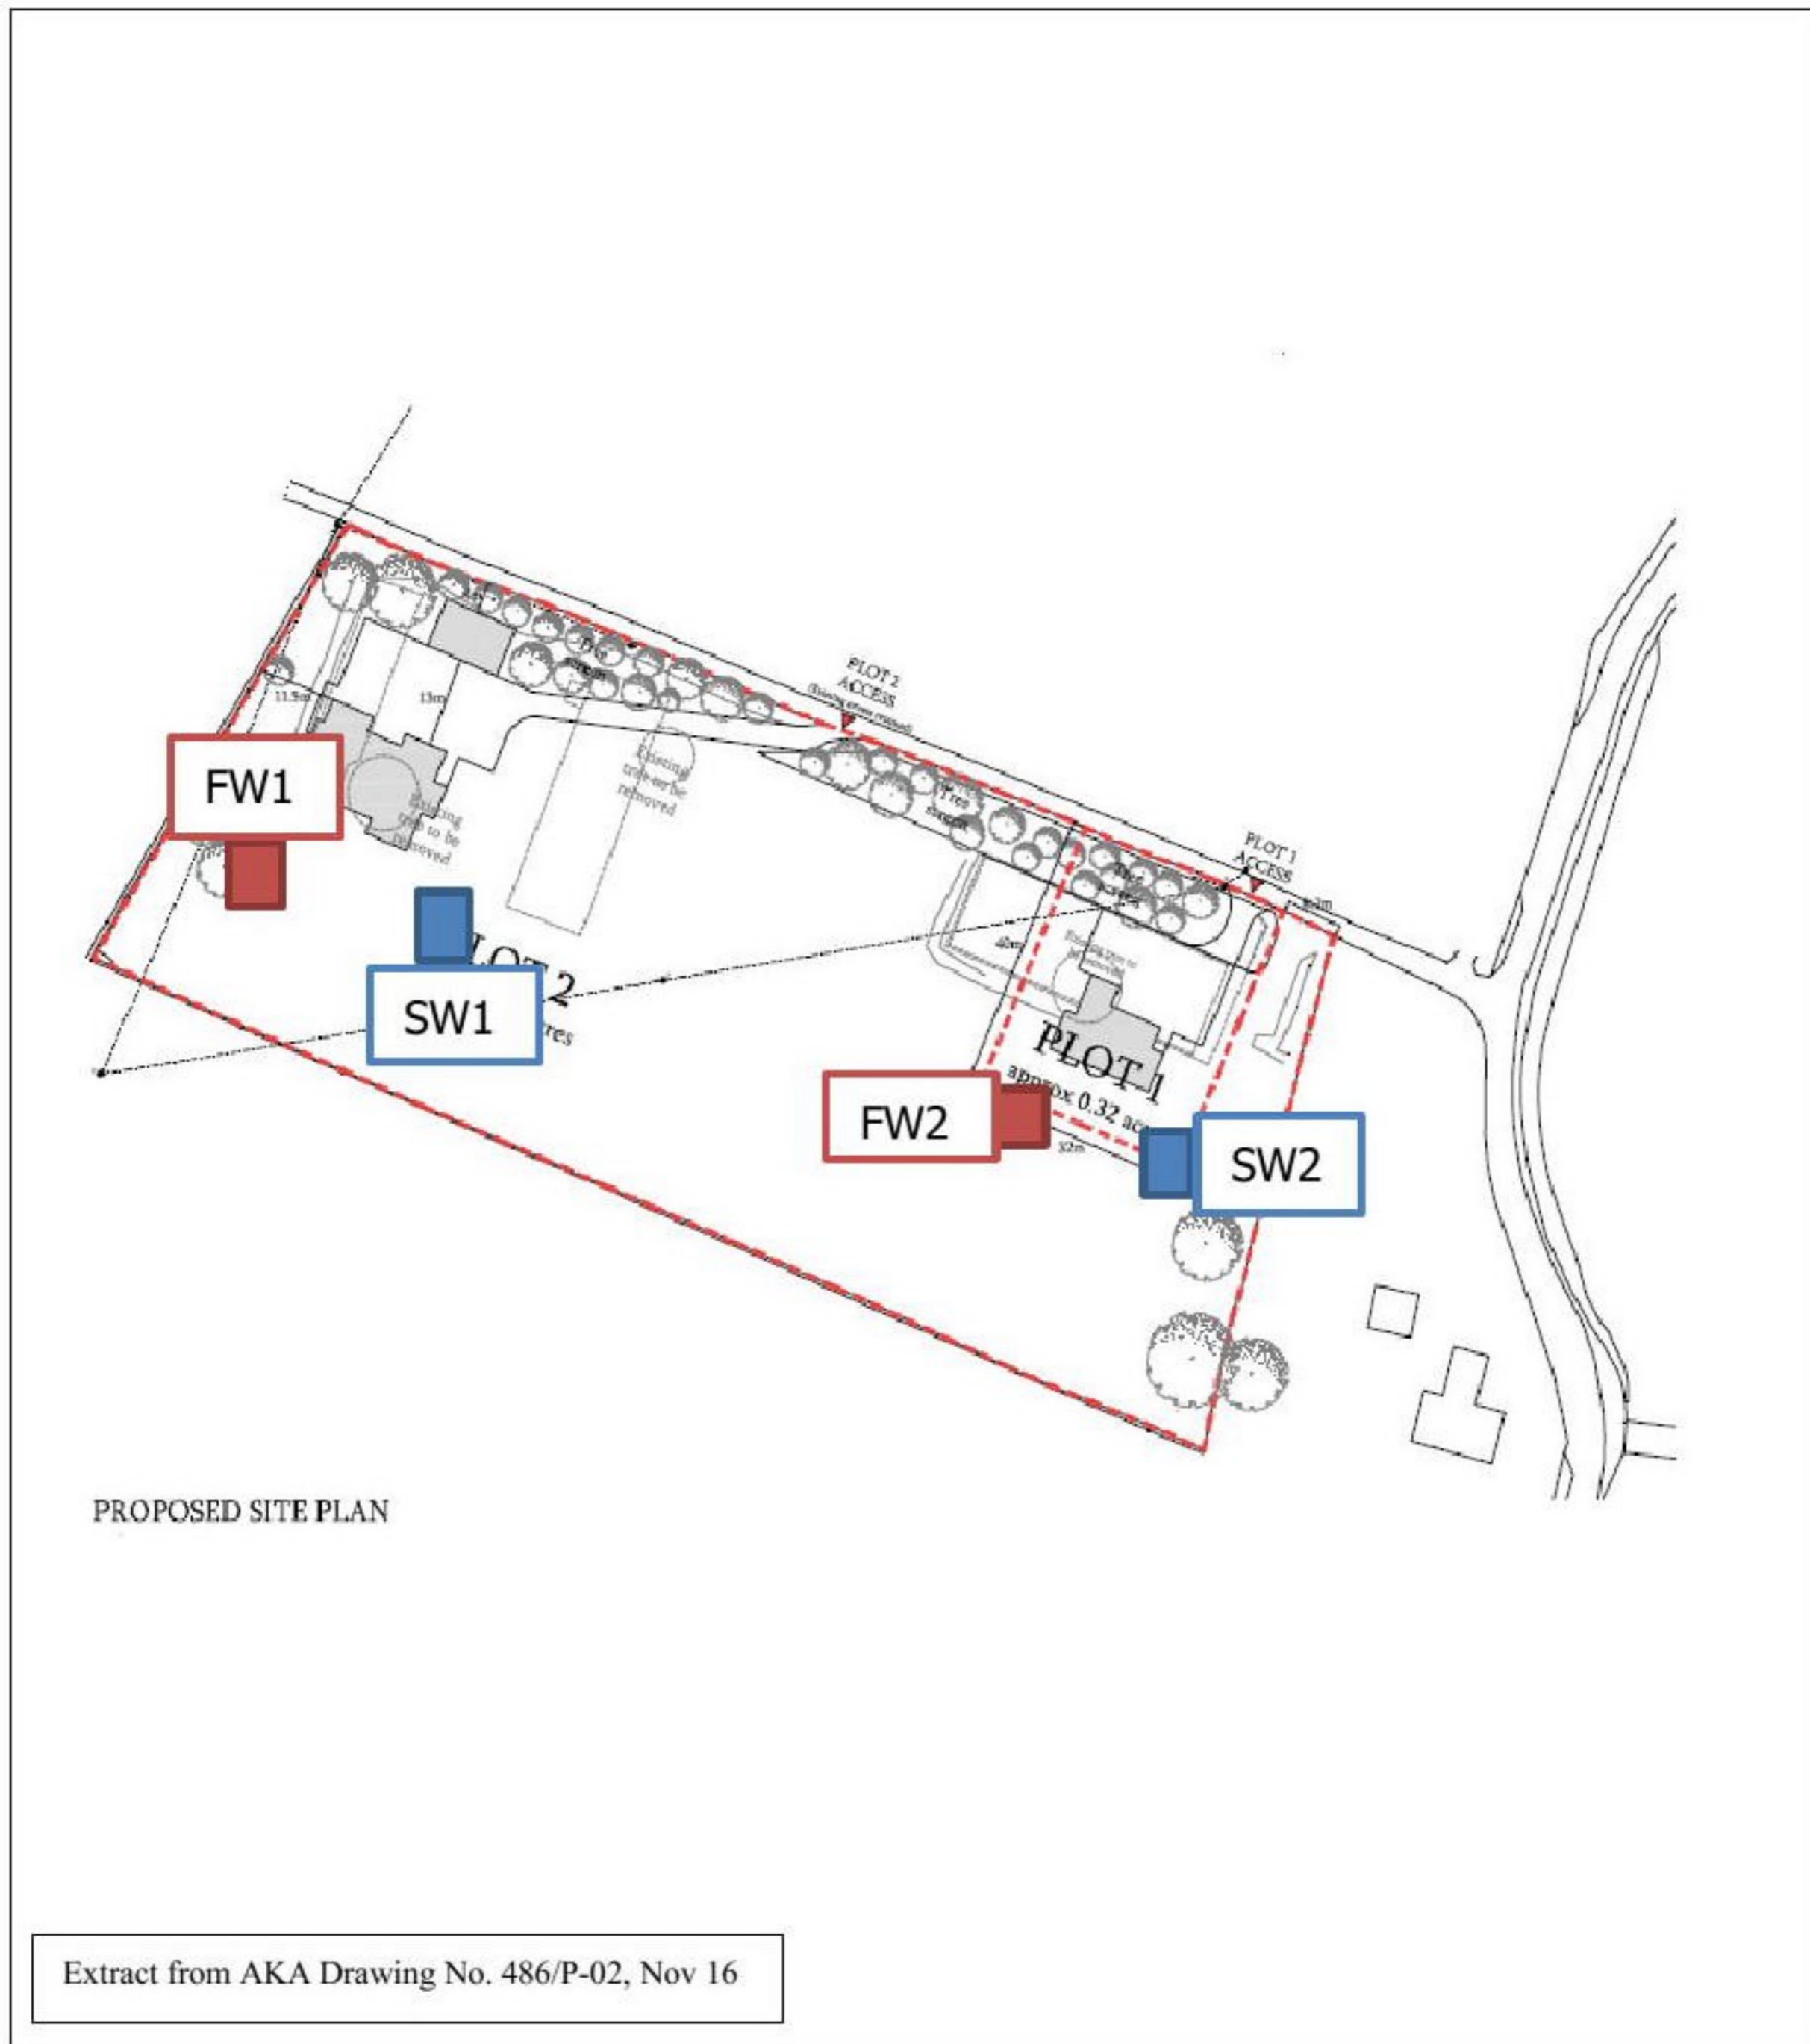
INDICATIVE SITE LAYOUT & TEST LOCATION PLAN
